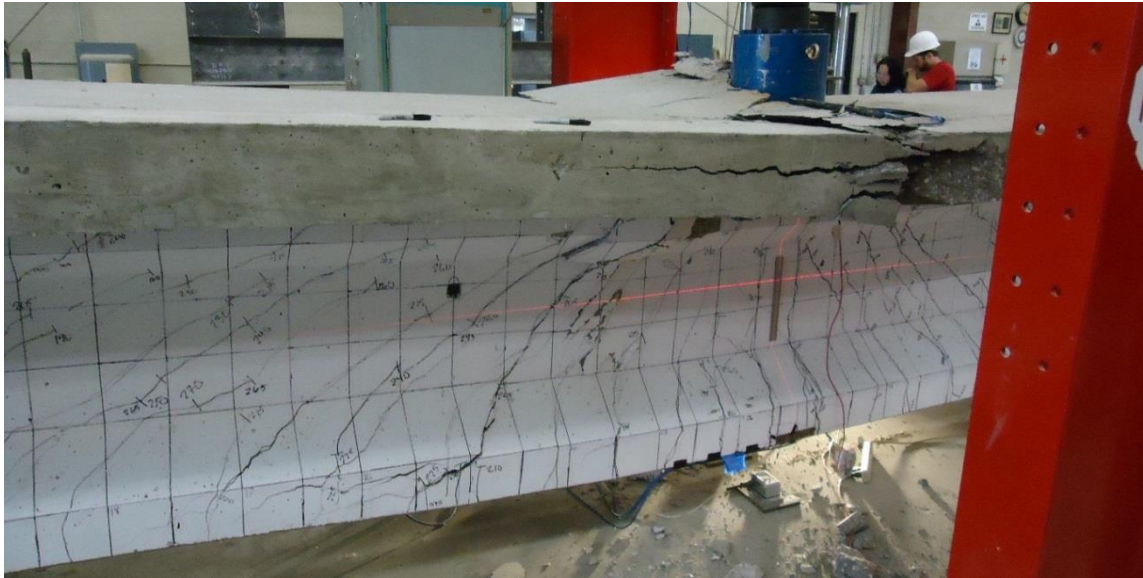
Test C2 failure, showing a large shear crack in the center of the image that entered the top flange causing catastrophic compression failure
